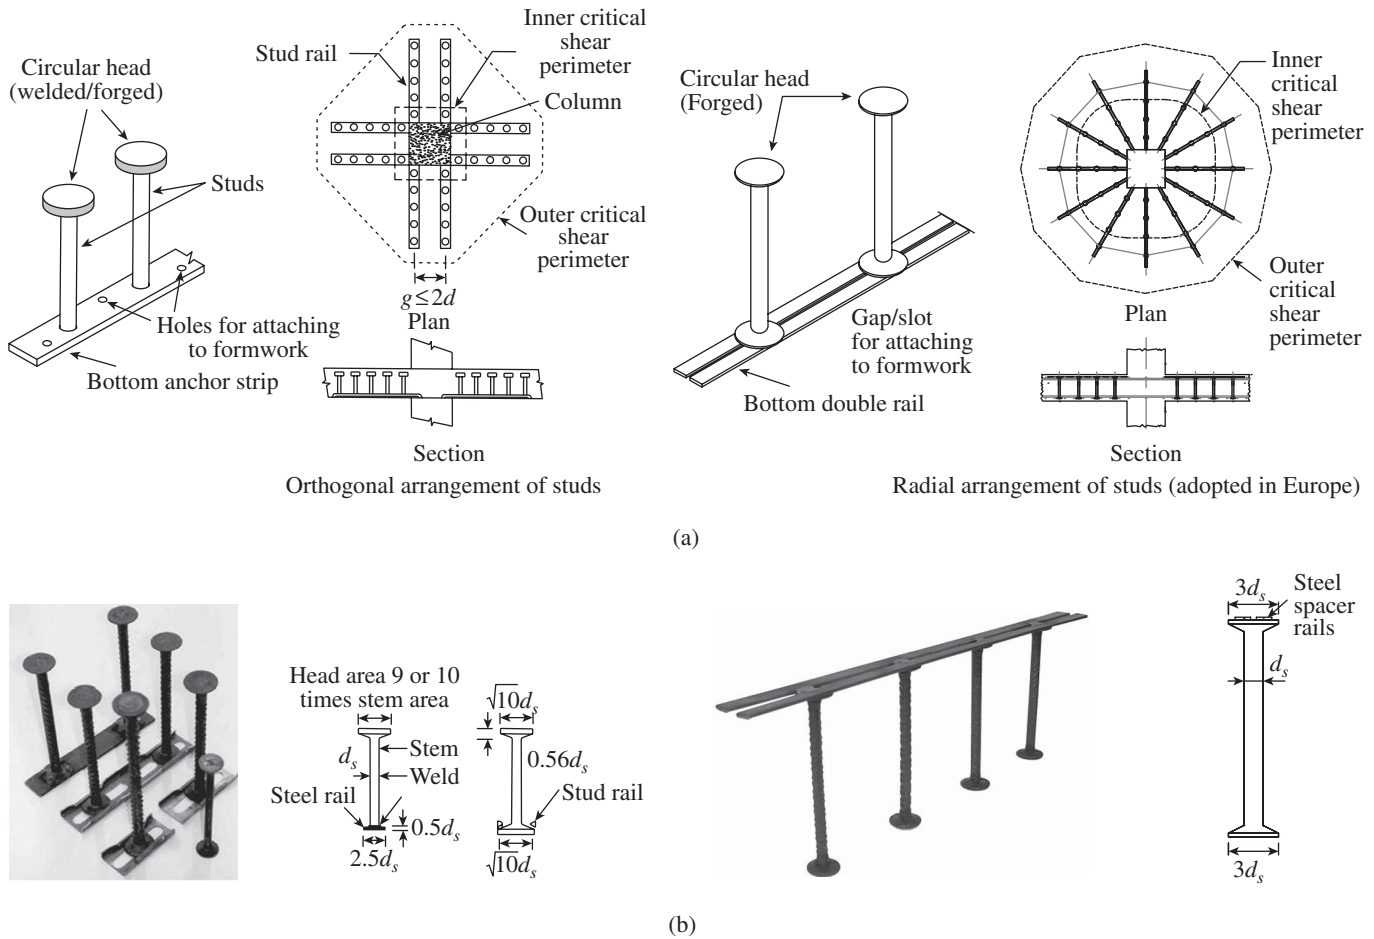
Headed shear studs (a) Headed shear stud reinforcement (b) Details of double-headed studs (Reprinted with permission from ACI)
